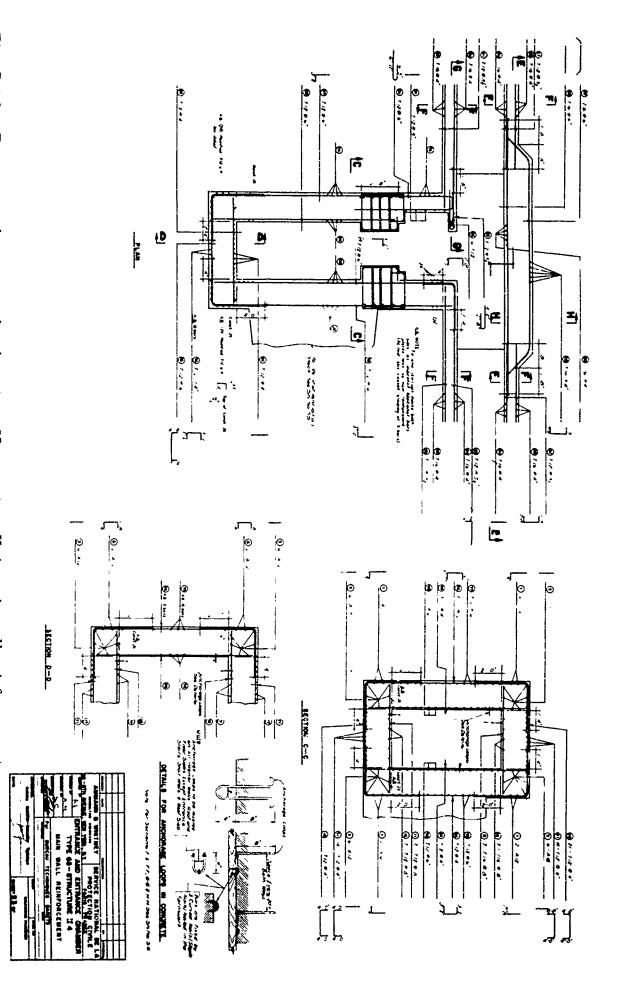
Entrance and entrance chamber, type 65, structure II-4, main wall reinforcement.
